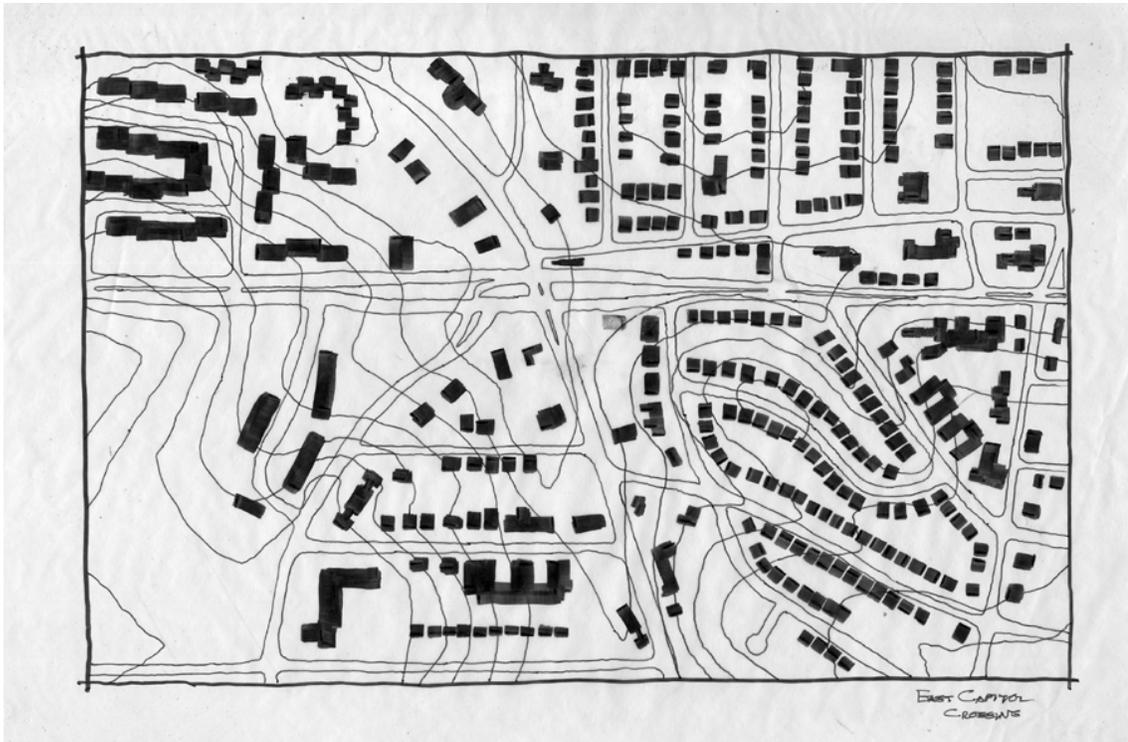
Site Plan, Intersection of East Capitol Street and Benning Road
